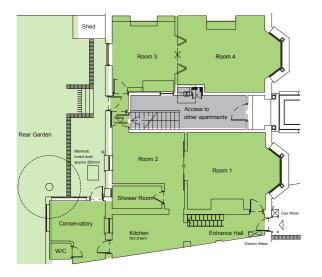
B EXISTING GROUND FLOOR PLAN Showing unit types
